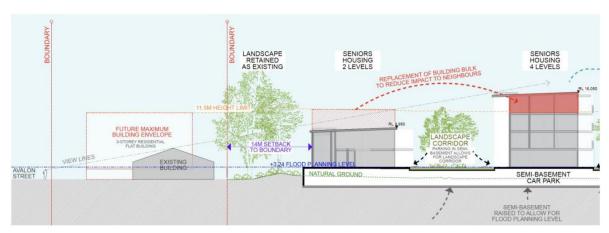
Urban Design Principles Section – Demonstrating the two storey seniors built form, significantly below the height plane, being setback 14m to the Southern boundary (Source: BHI Architects)
